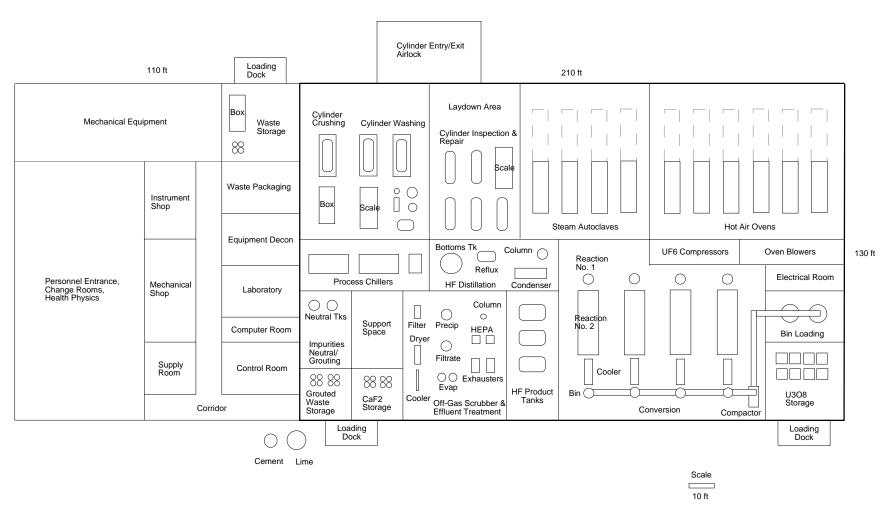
Process Building General Arrangement Conversion to U3O8 and AHF
